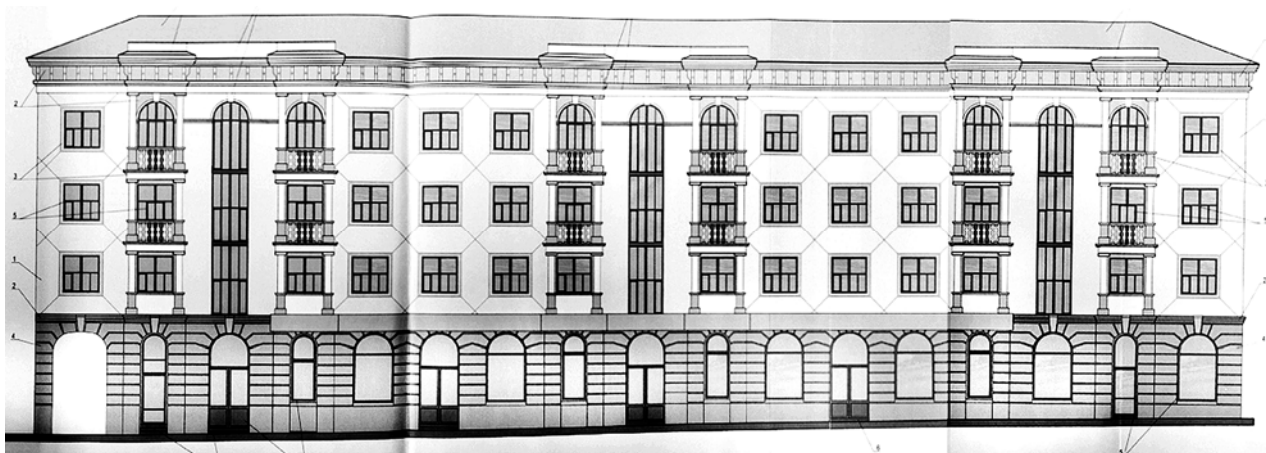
The facade. Residential house on 81 Soborna Str., Vinnytsia (Rekuta, 2007)
